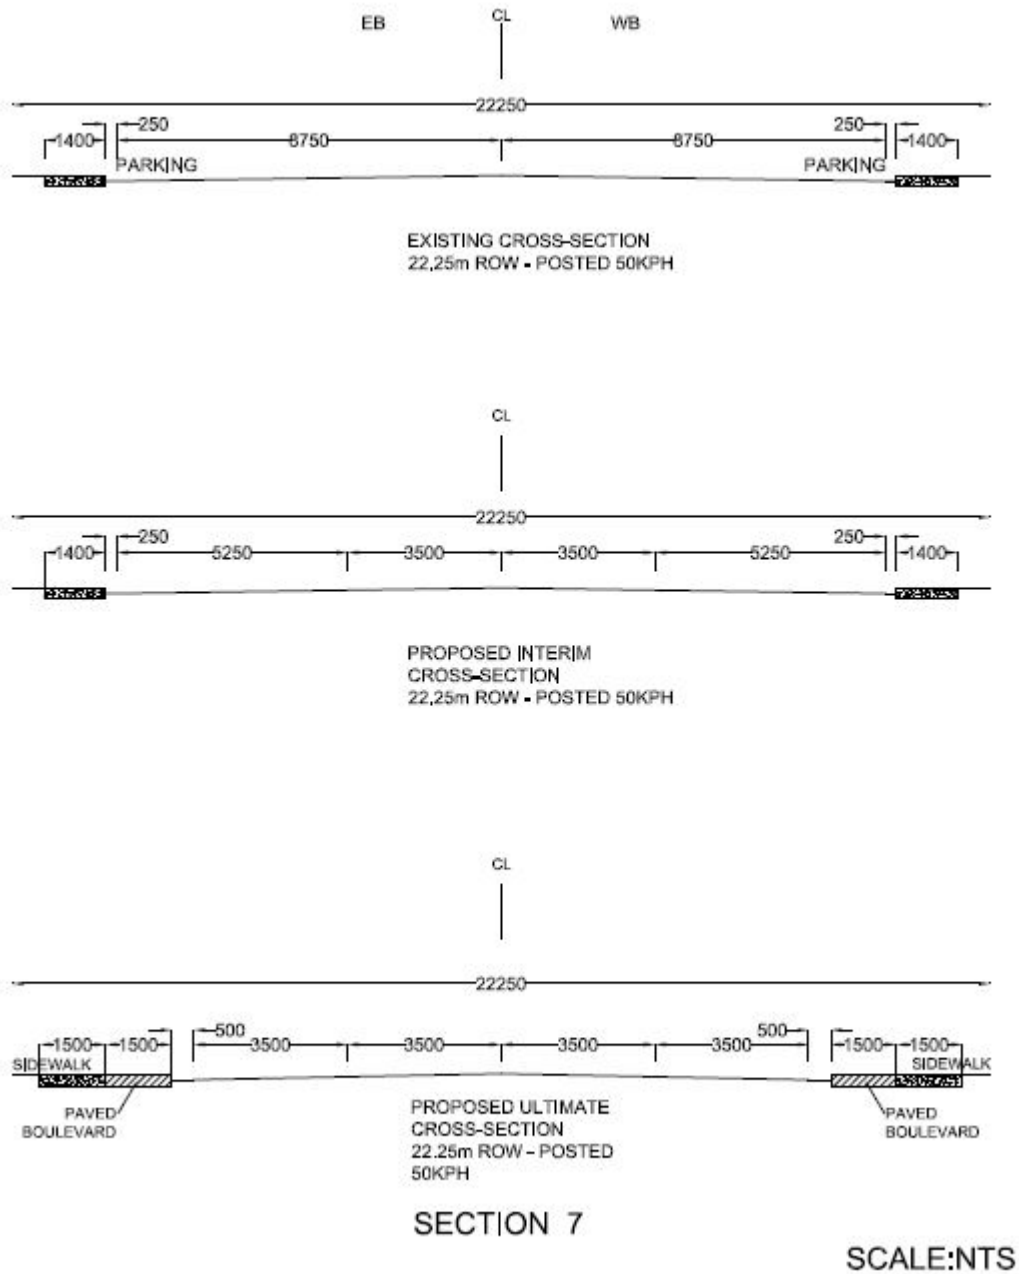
Proposed Section 7 – Hwy 22 at 1st Street West
